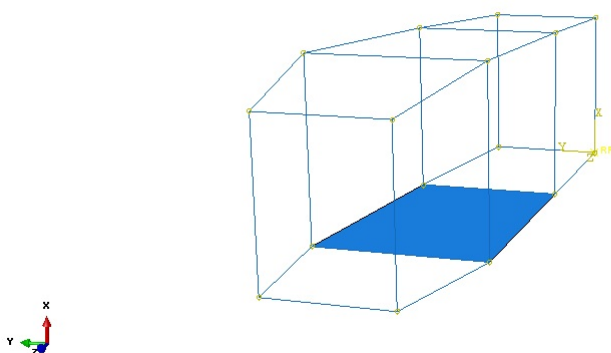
Bottom Panel Only Case: Bottom panel attached to the steel frame.
